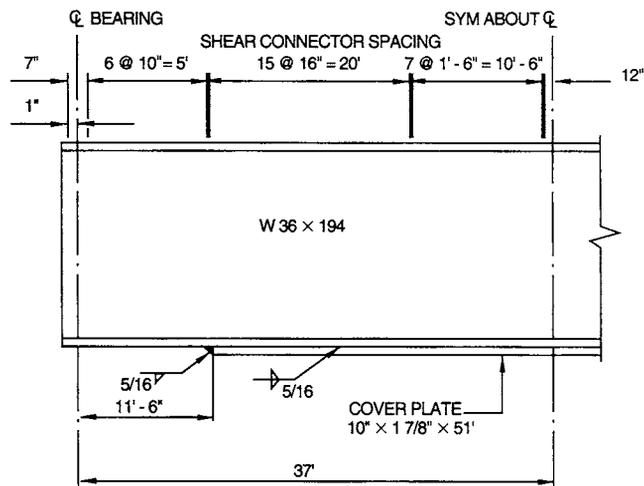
Shear connector spacing along the top flange of a stringer.
